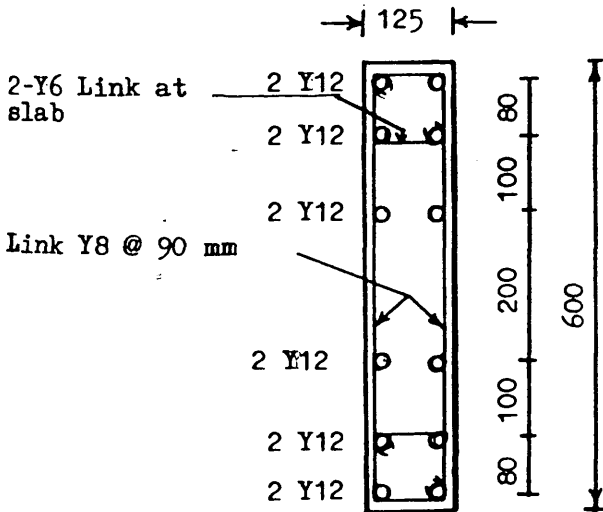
A horizontal section in the wall of model MS5 showing the reinforcing details
